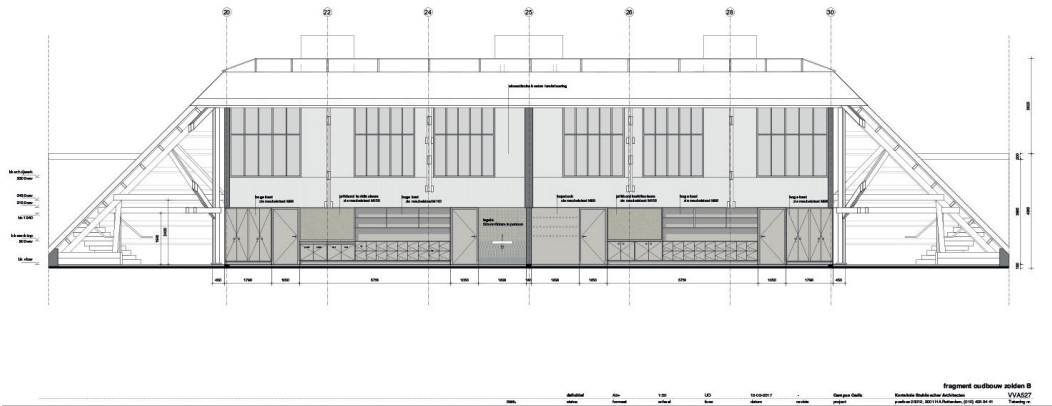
Section of the old building's attic at Campus Cadix. Source: KSA
